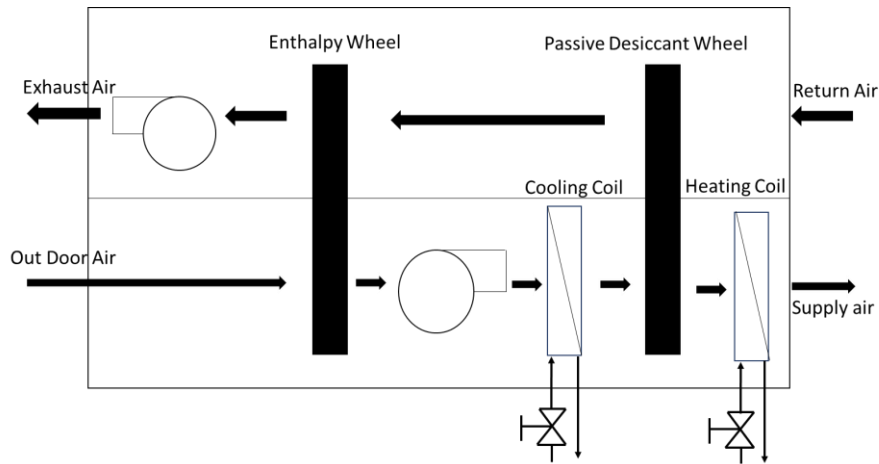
Arrangement of components in the Air Handling Unit (AHU) of the case building.
